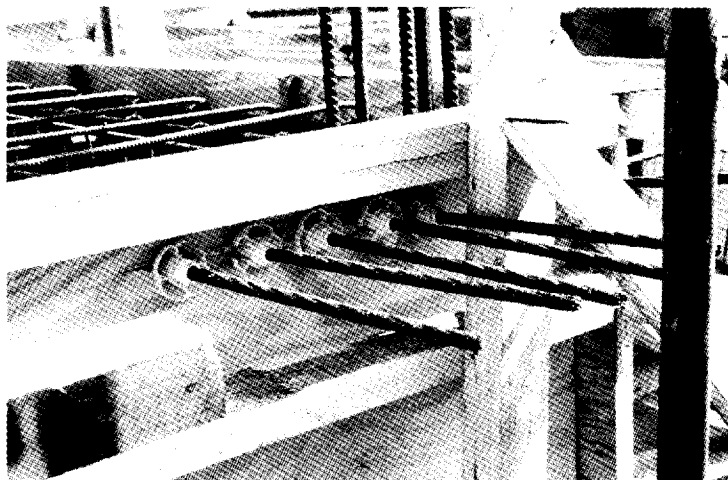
Anchorages for unbonded tendons: fixed to formwork.
